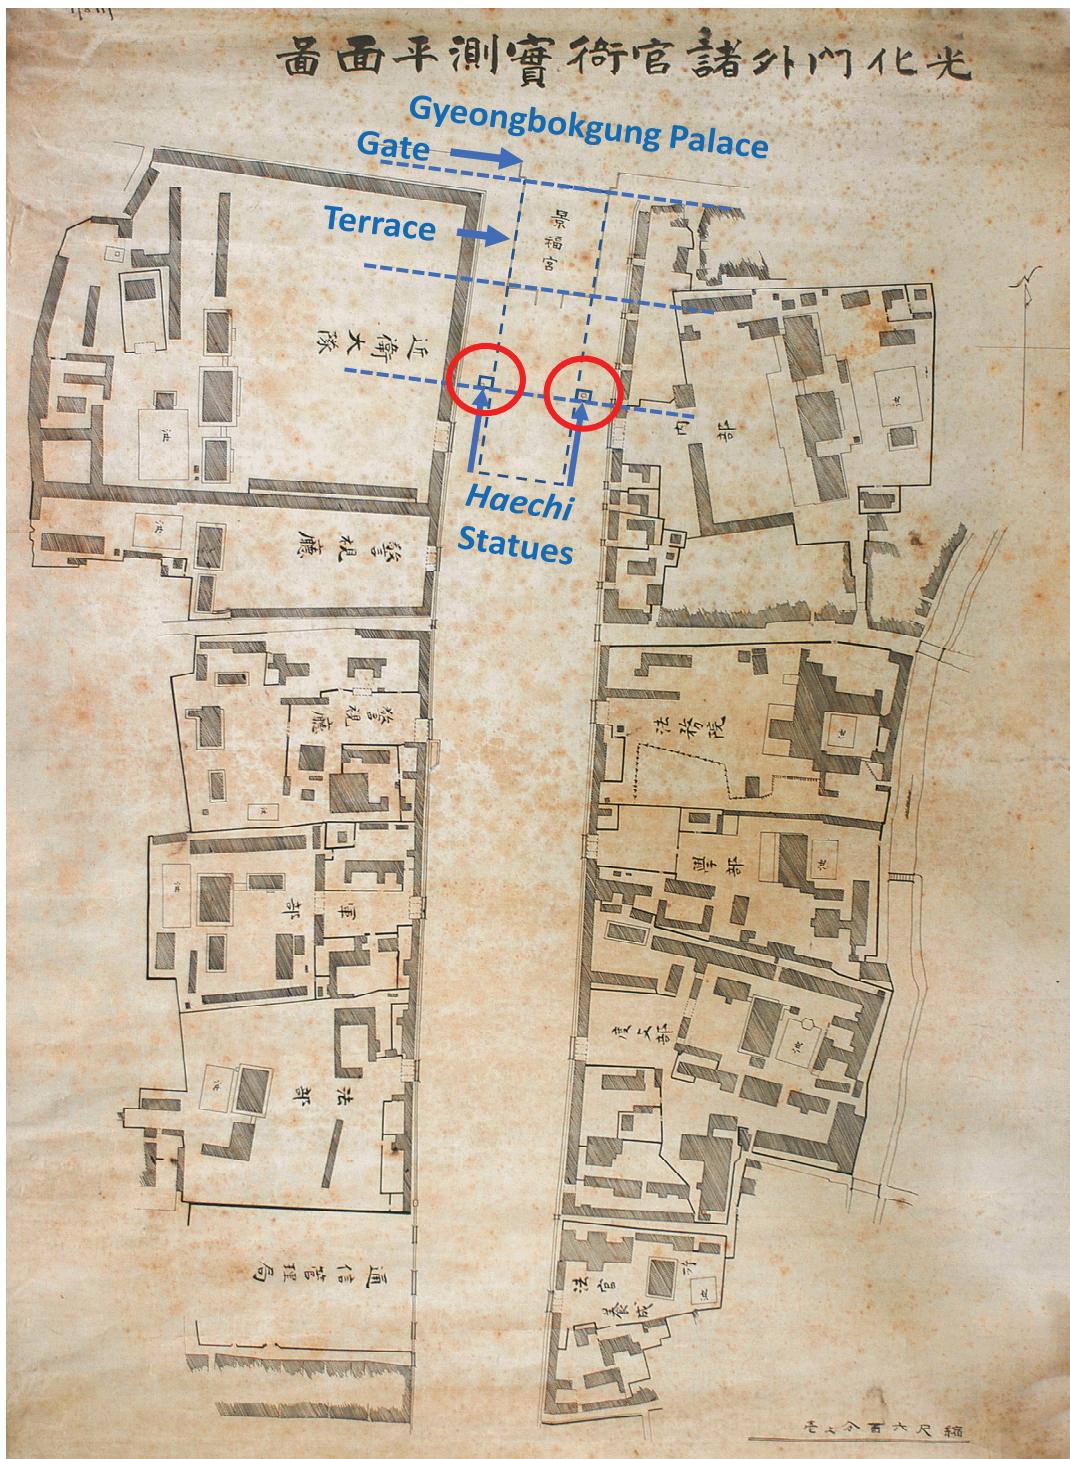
The Surveyed Map of a Government Office; This is the layout of the government office building on Yukjo(六曹) Street and the floor plan of each building structure, which appears to have been created around 1907-1910. Centering on Gwanghwamun Gate, to the east, the Ministry of Interior, Judicial Office, Ministry of Education, Ministry of Taxation, Judicial Training Center, and on the opposite side, the Guards Battalion, Police Department, Military, Justice, and Communication Management Bureau are lined up in that order (Seoul Museum of History, 2021).
